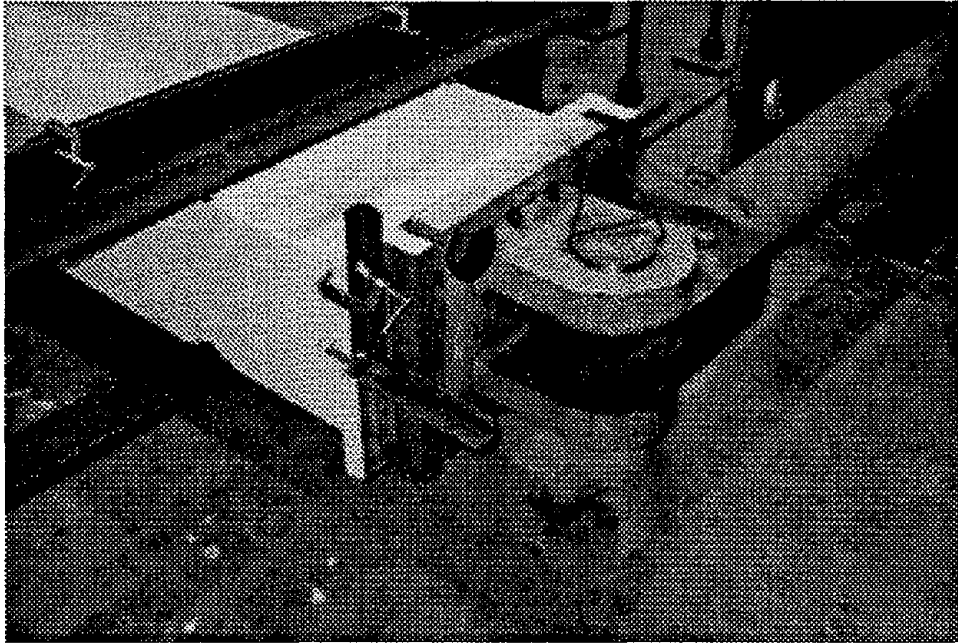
Photograph showing the clevis connected to beam end-plate and hydraulic actuator.
